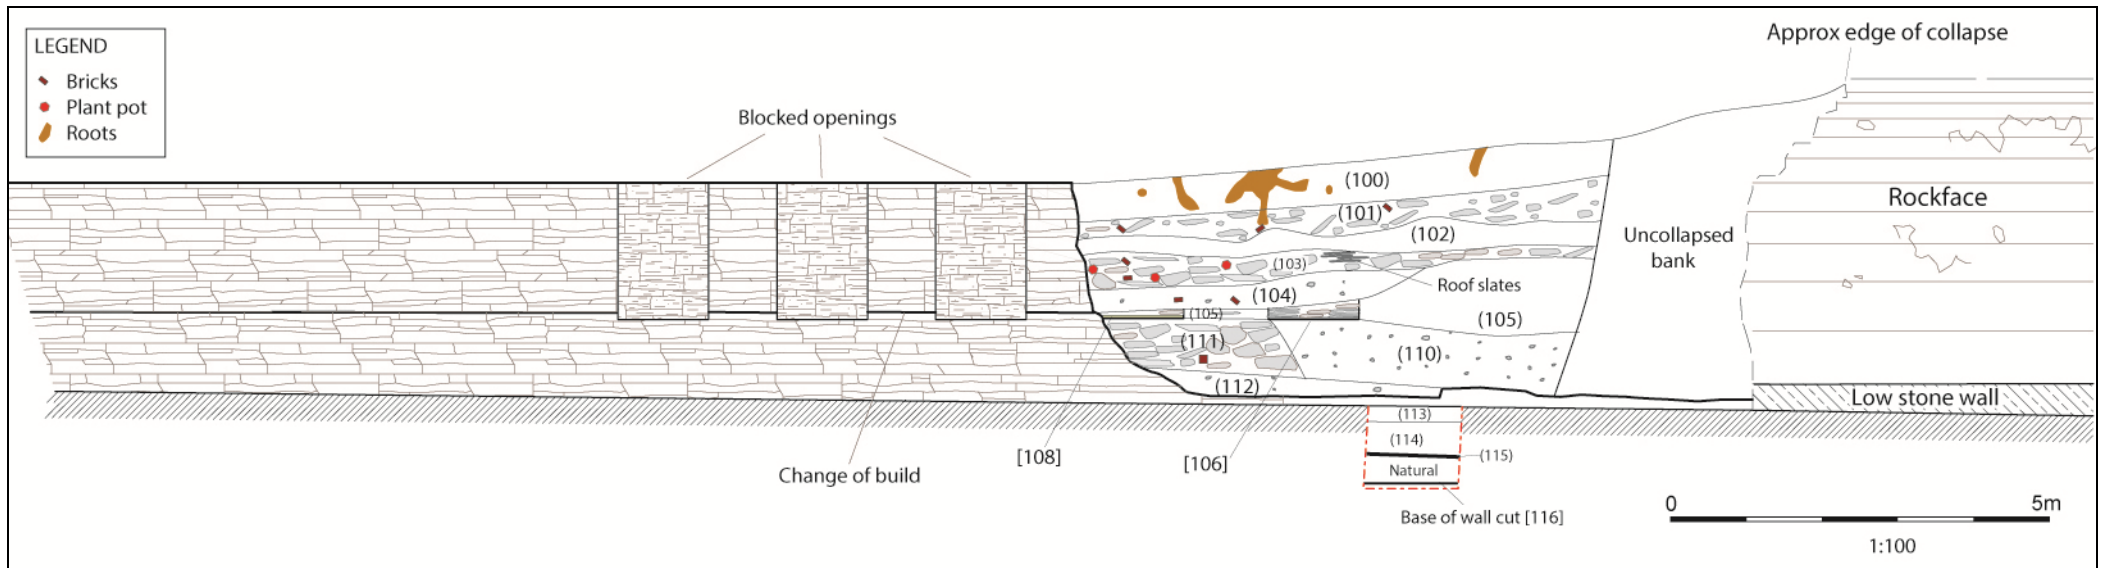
Elevation/section showing the wall and deposits exposed behind, prior to grading.
